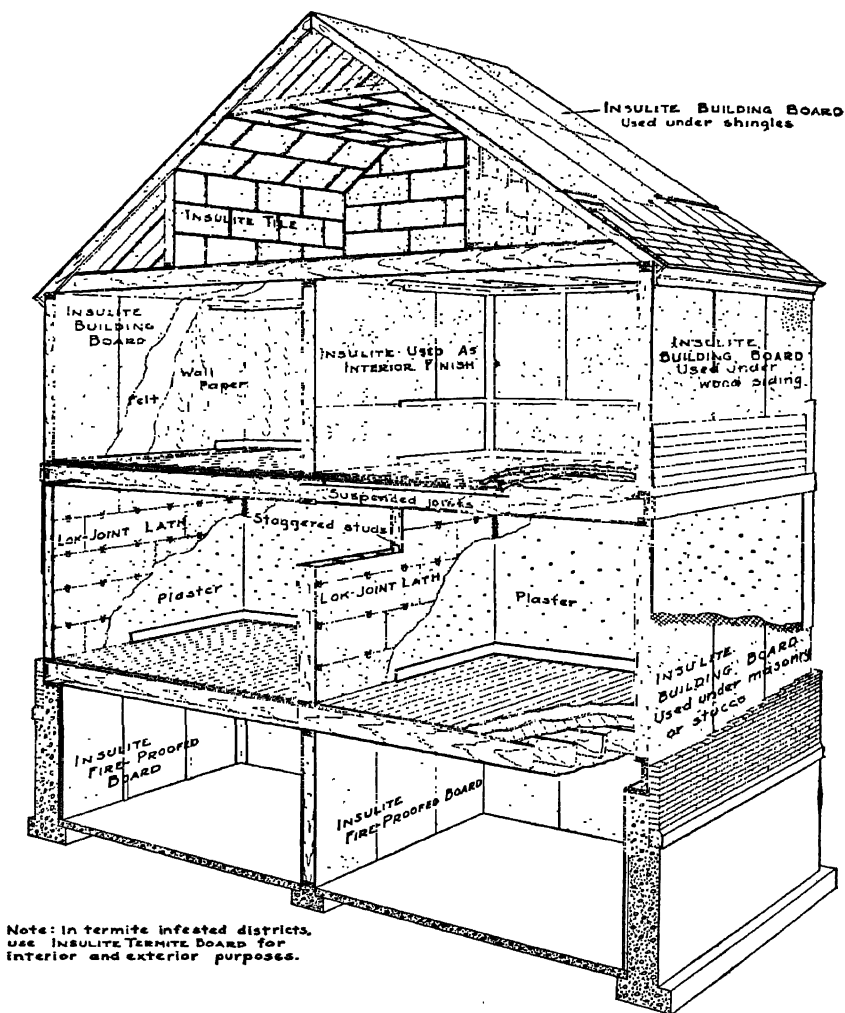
Section of Frame House Showing a Typical, Recommended 100 Per Cent Application of Insulation
